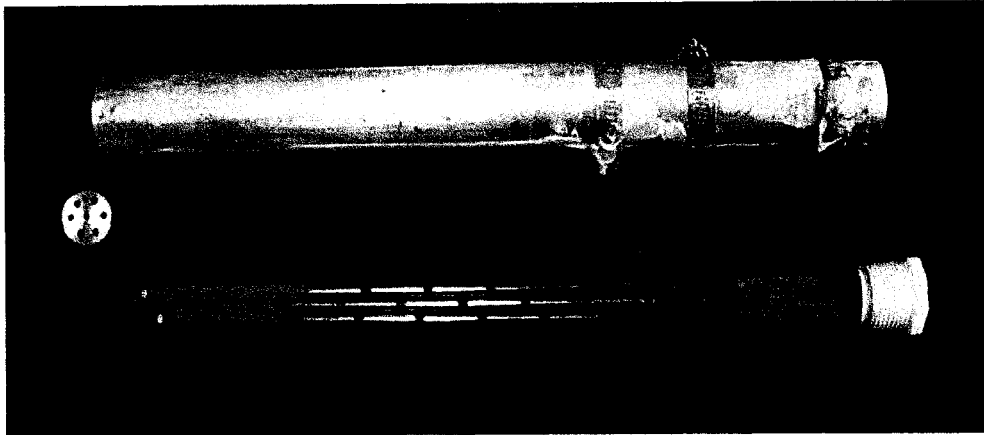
Partially assembled multiple strand steel meso-rod specimen
